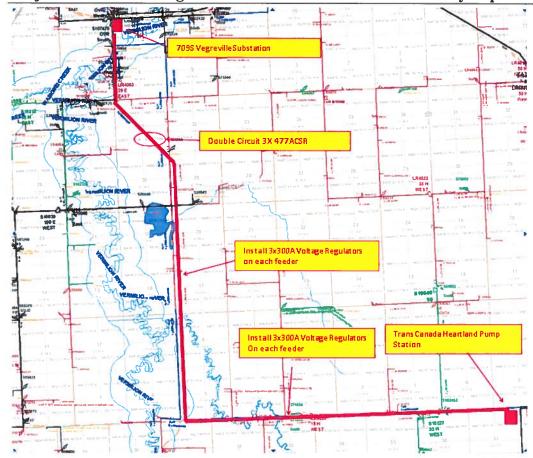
Proposed New 25 kV line routing from 709S Vegreville Substation to TransCanada Pump Station
